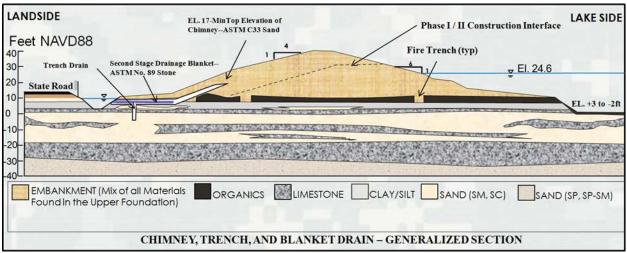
Generalized section of chimney, blanket, and trench drain
